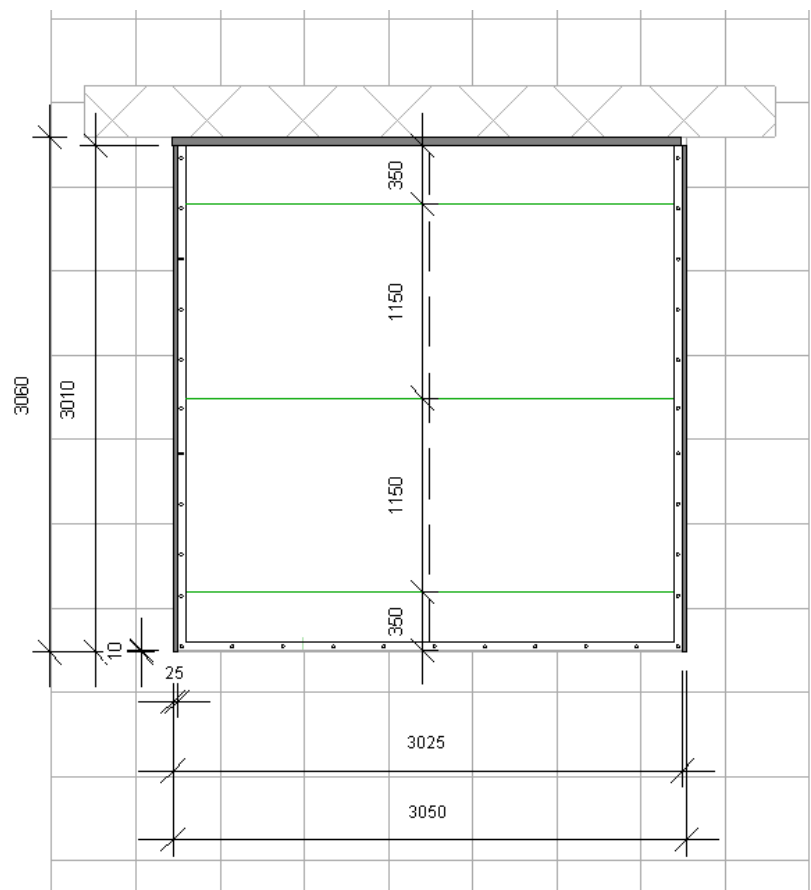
Front view of the assembly of the first sandwich panel wall – Test 4'.
